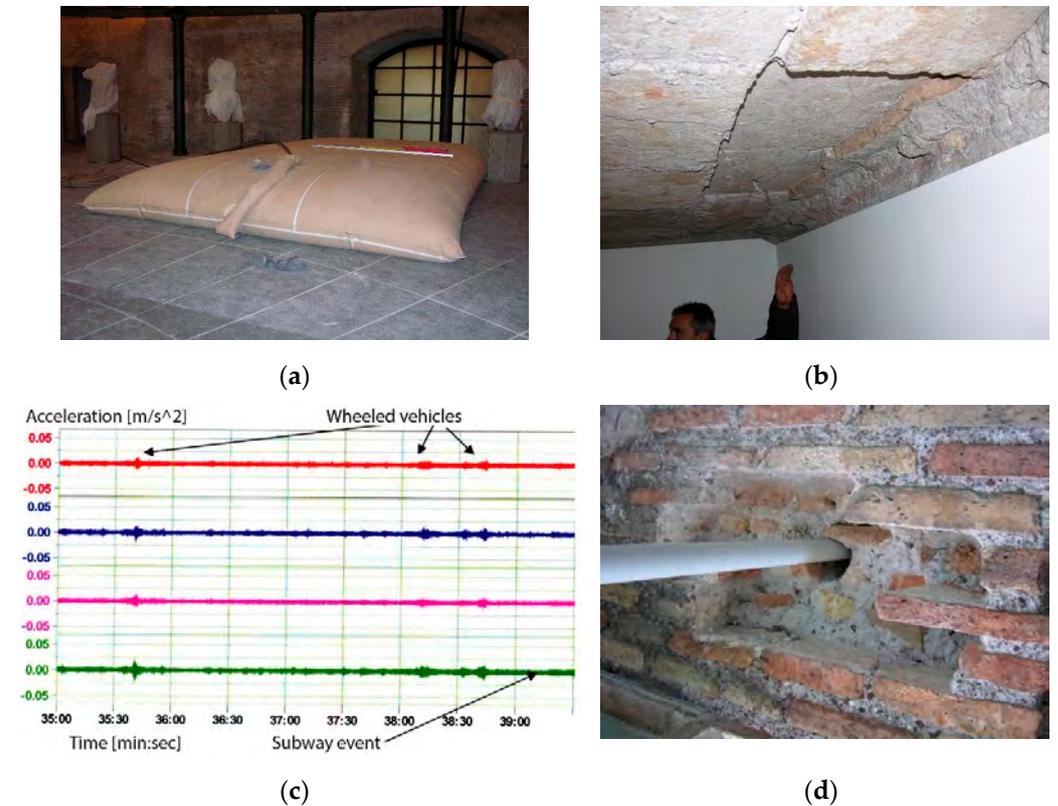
(a) Local test on the Octagonal Hall, (b) a visible crack, (c) monitoring of the vehicular traffic and the nearby subway line, (d) a chain inserted to control the opened crack.
